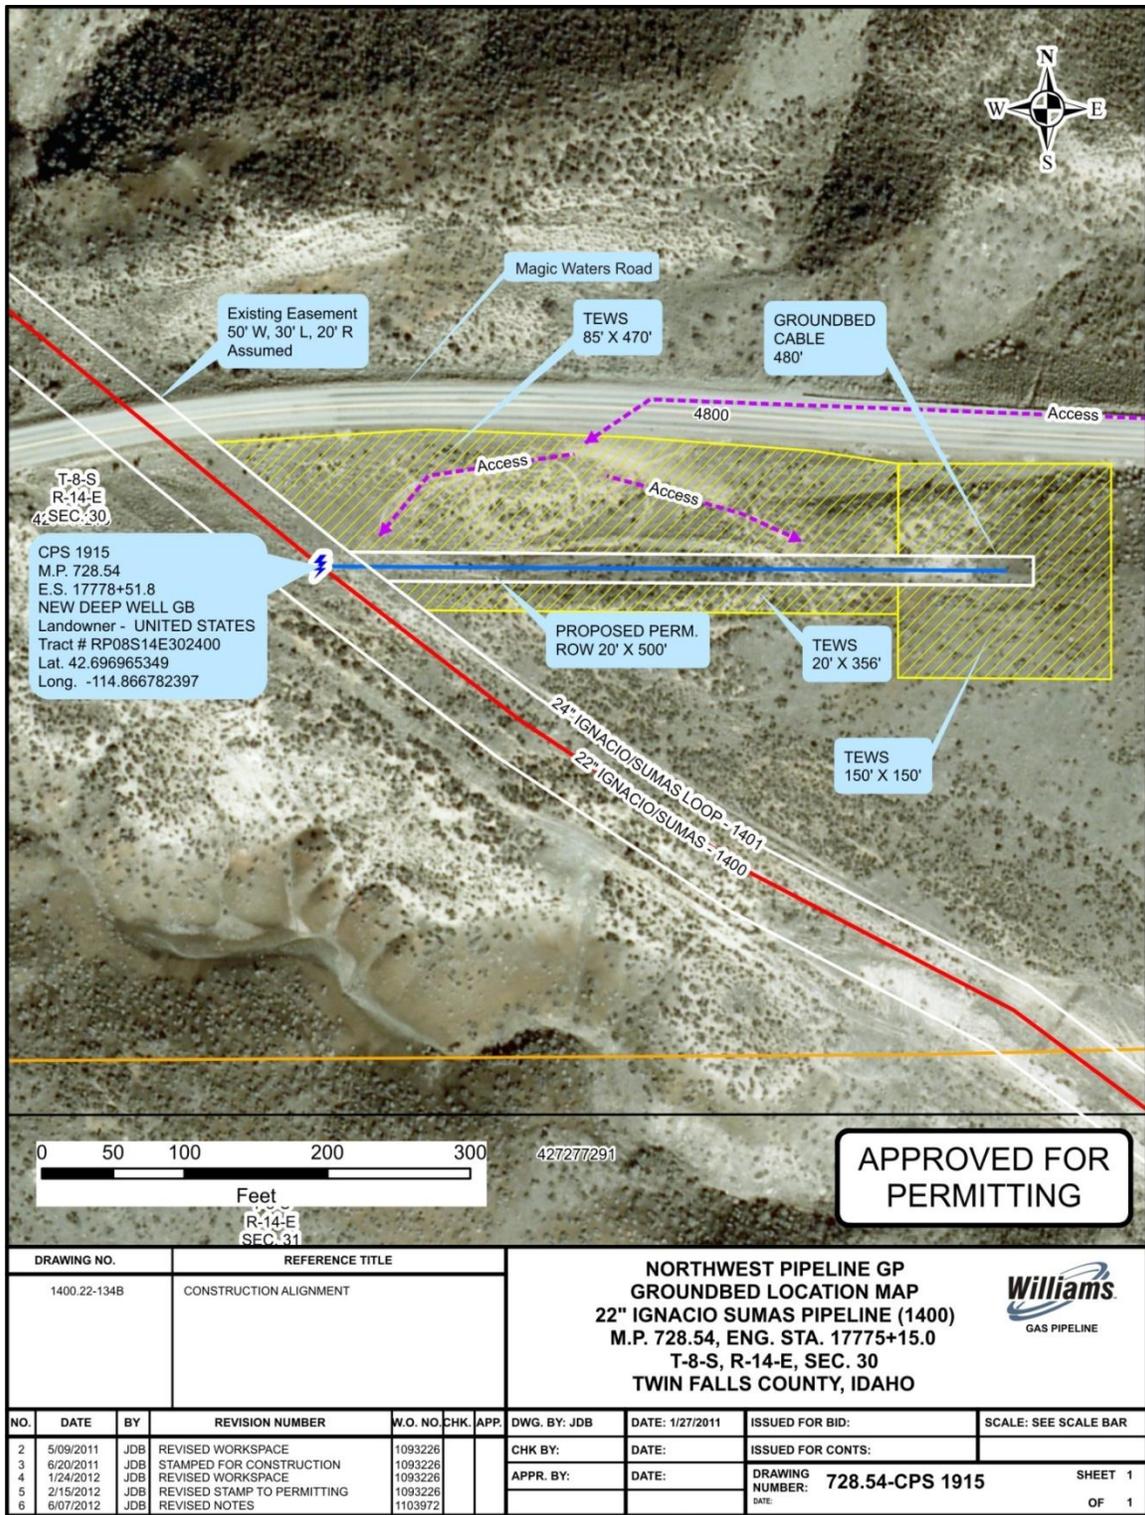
Aerial Photograph of Parcel Showing Proposed Cathodic Protection Site 1915 Construction Area.
